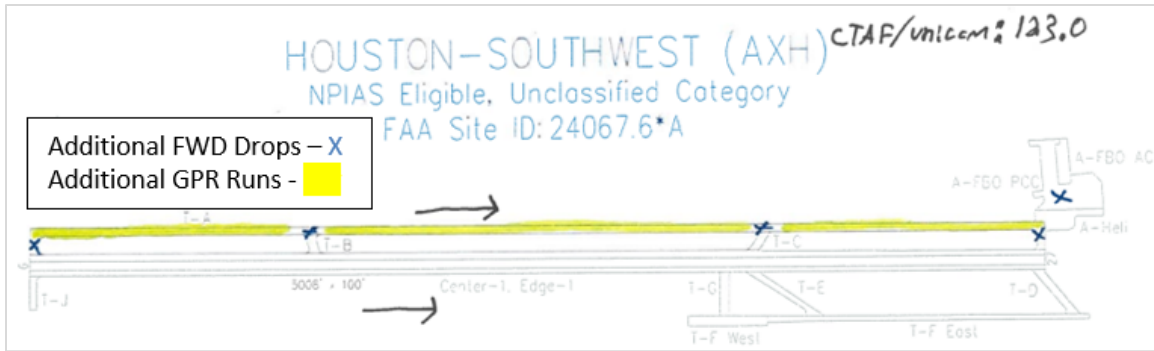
NDT Airport Testing Plan for Houston SW Airport (AXH).
